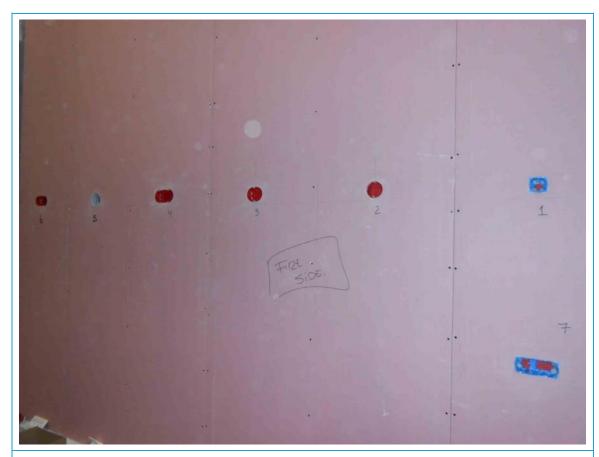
Hollow wall boxes installed in wall at the exposed side (ES)
